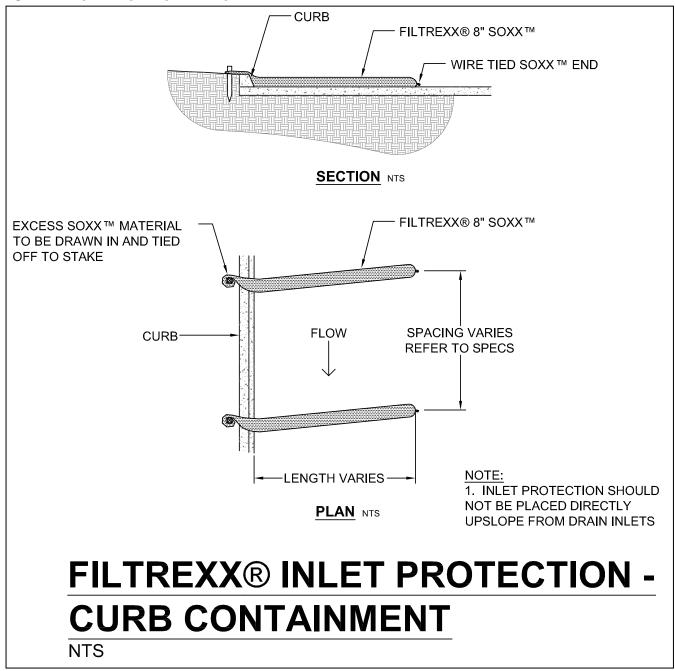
Engineering Design Drawing for Curb Sediment Containment Inlet Protection
